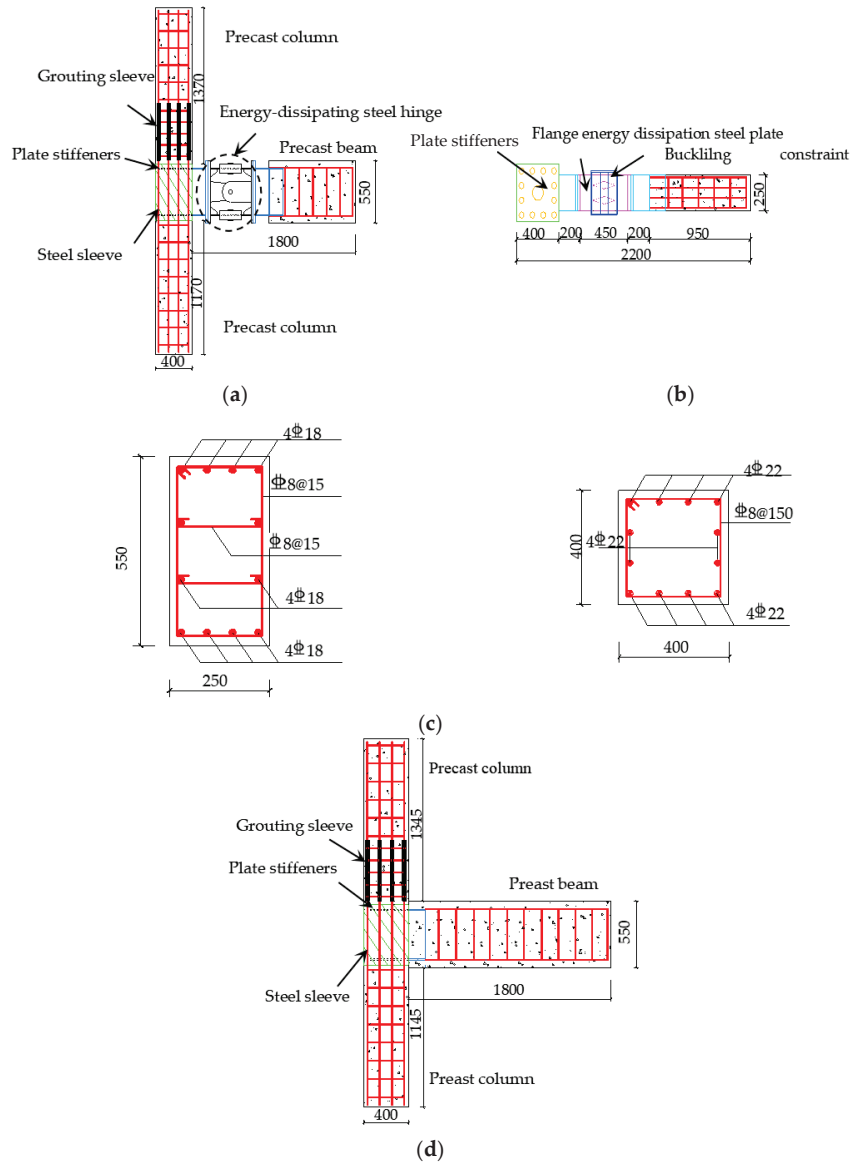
(a) Front view of the precast replaceable beam-to-column joint with an energy-dissipating steel hinge; (b) vertical view of the precast replaceable beam-to-column joint with an energy-dissipating steel hinge; (c) configurations of the beam and column; (d) front view of the steel sleeve confined concrete joints (unit: mm).
